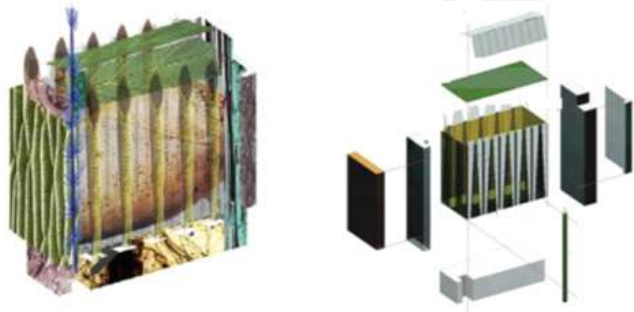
wind pipes on the north facade & overlapping layers of the facade
